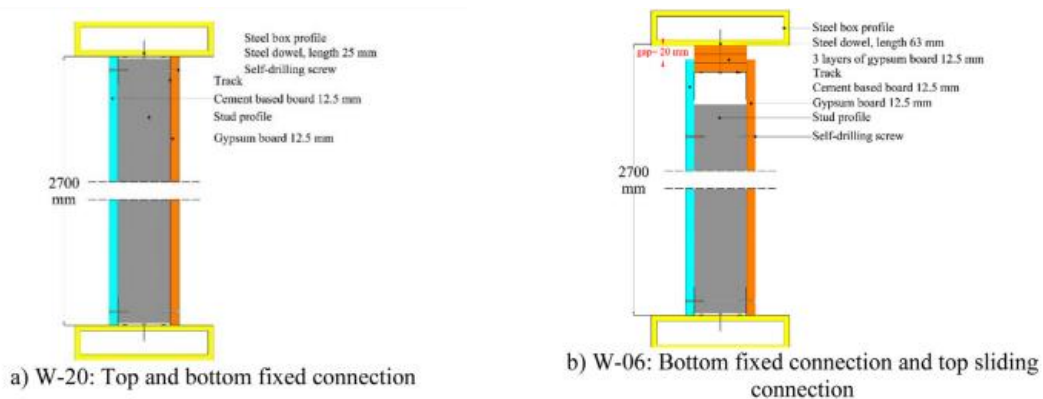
Vertical Section of façade with fixed and sliding connection.
